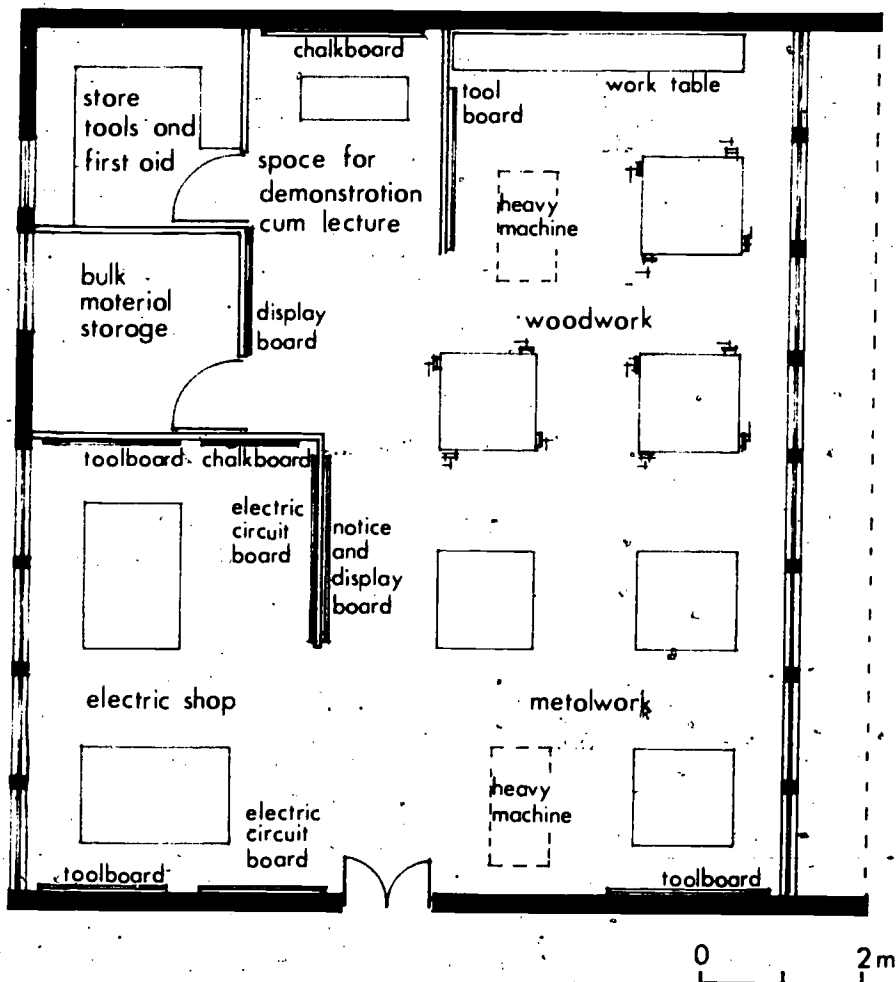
Plan views of workshop and laboratory buildings adapted from plans of schools in Sri Lanka.
